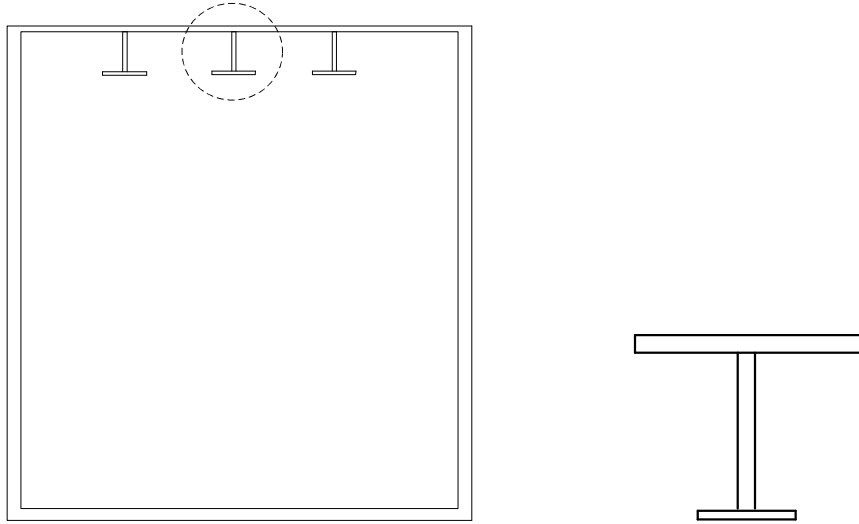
Longitudinally stiffened box and a stiffener strut
